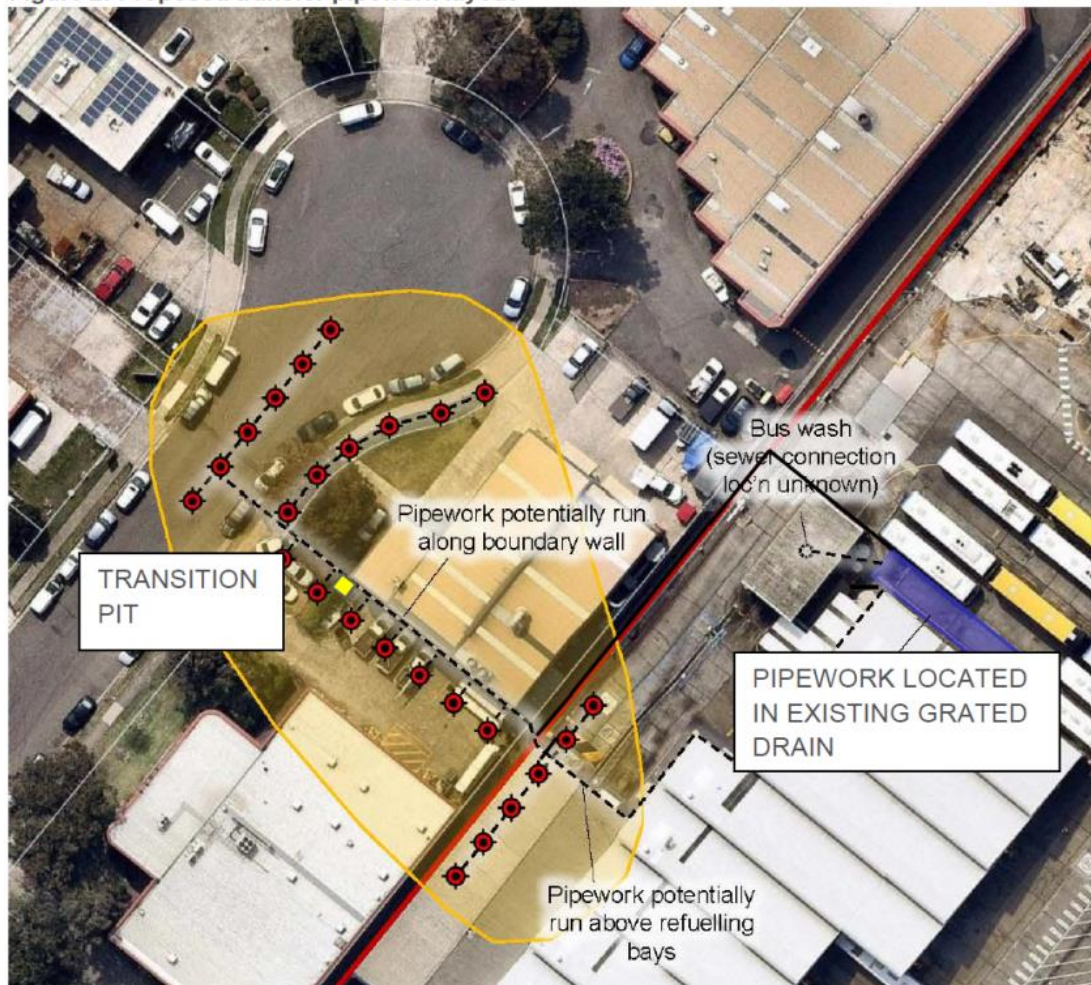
STA's Concept Site Plan showing connection to drainage in Taronga Place
